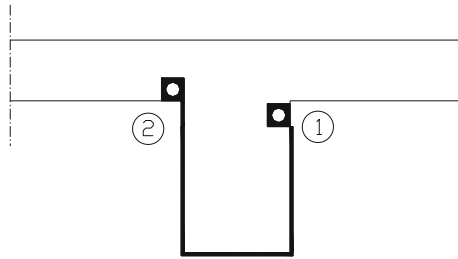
NSM bars as anchors for U-wrap shear strengthening of an R.C. beam
